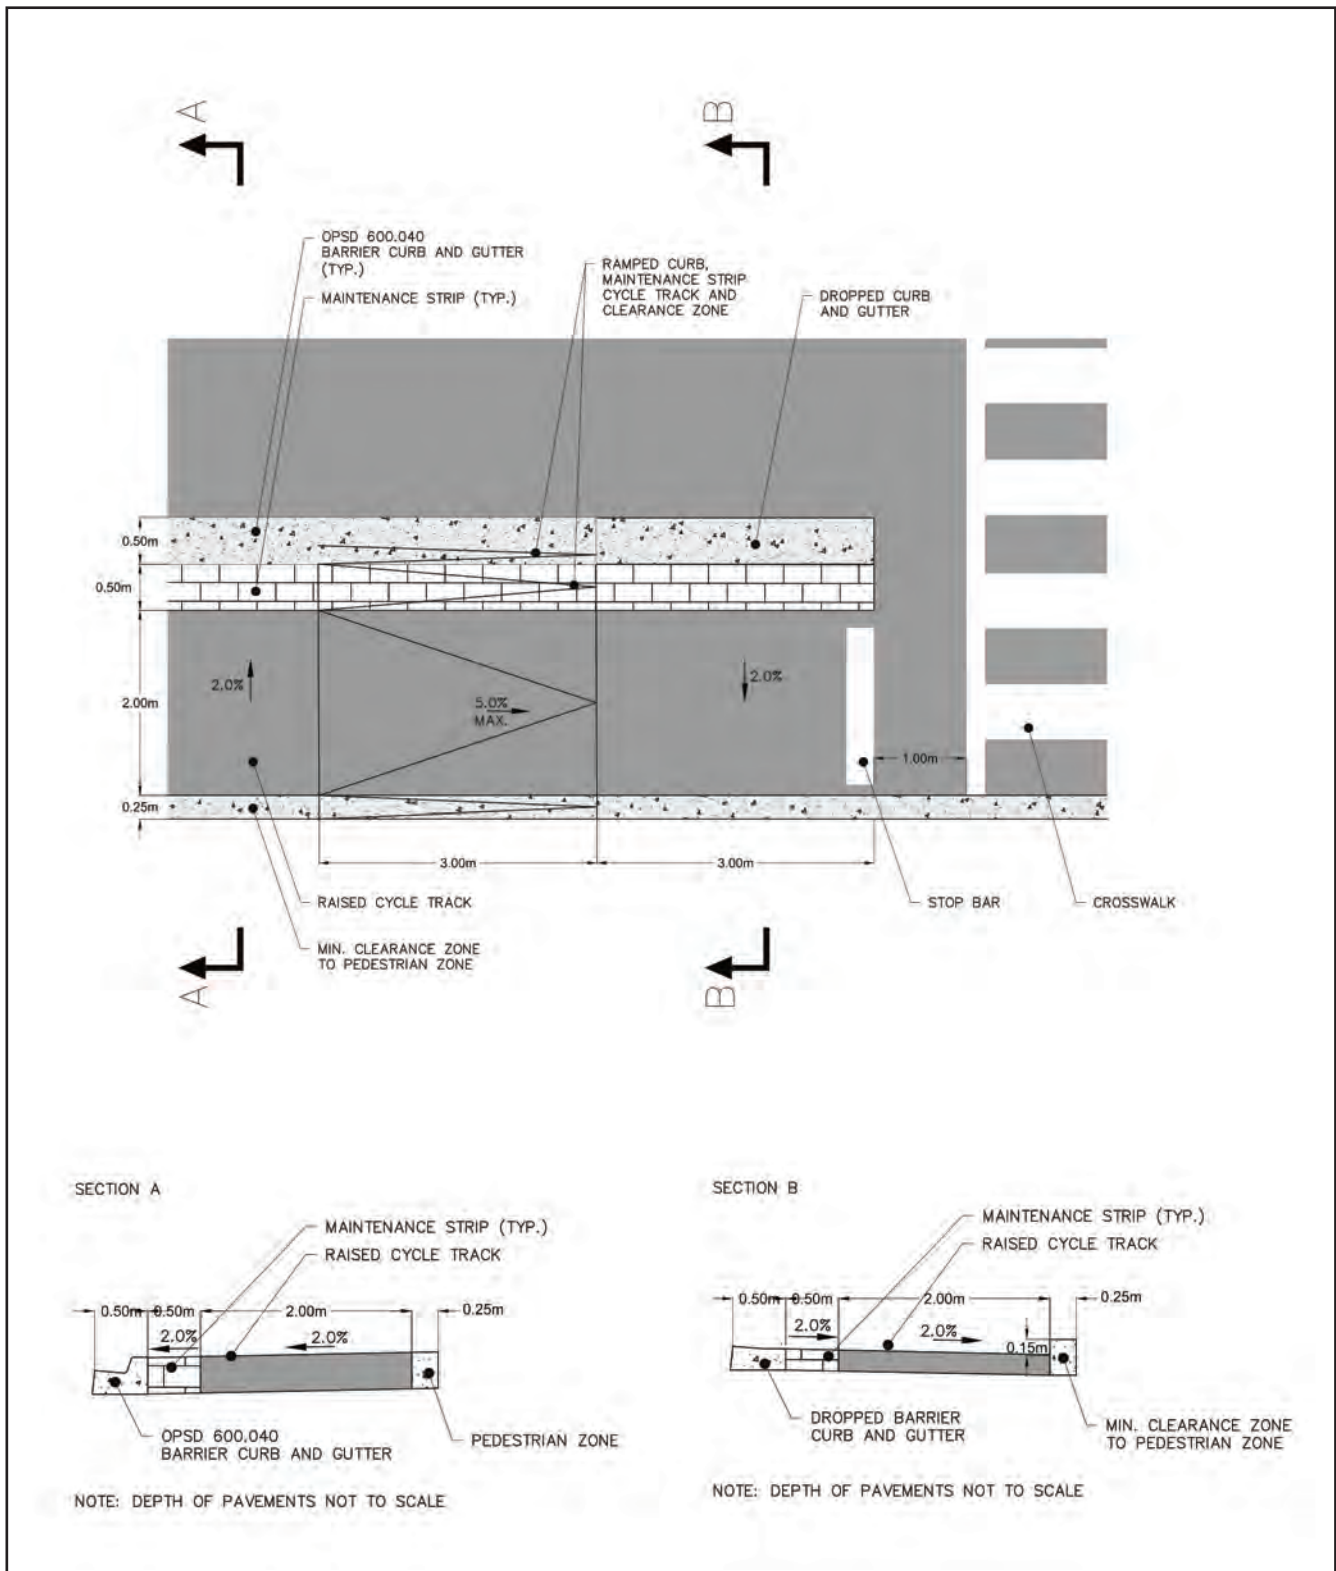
Sample Detail for Raised Cycle Track at Intersection
